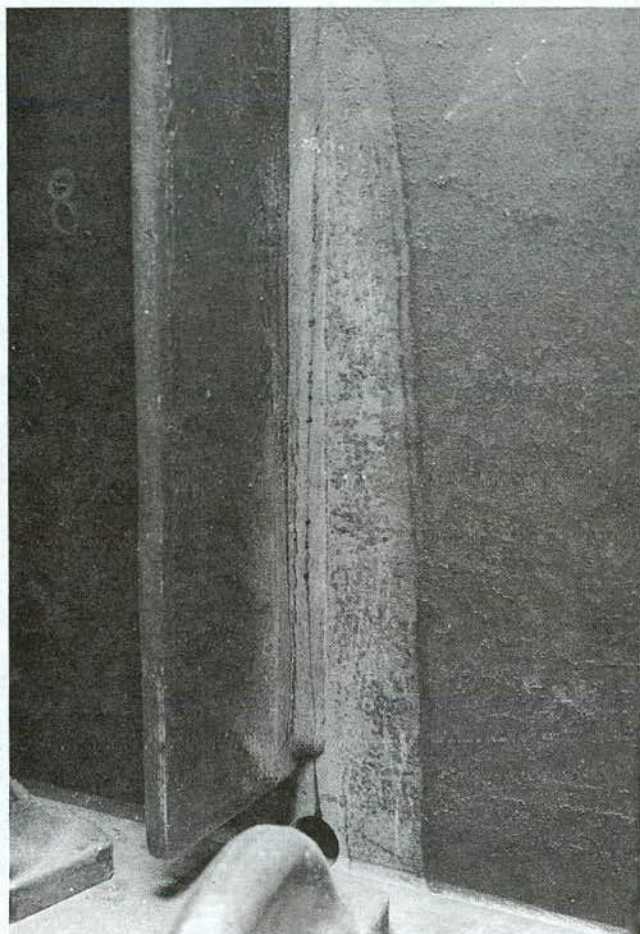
Fatigue crack originating on far side stiffener weld toe of Girder 2N.
